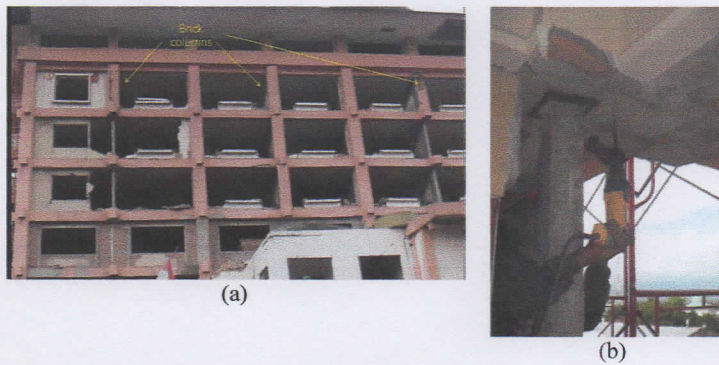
Replacing masonry column with practical column (a); installation of practical column (b).
